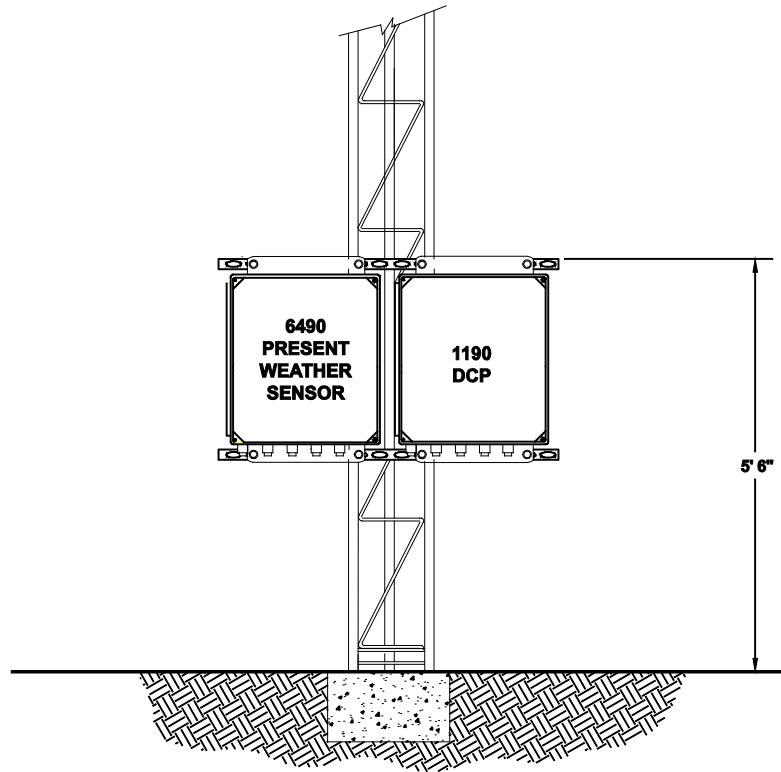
Tandem Present Weather Sensor and DCP Enclosure Mounting
